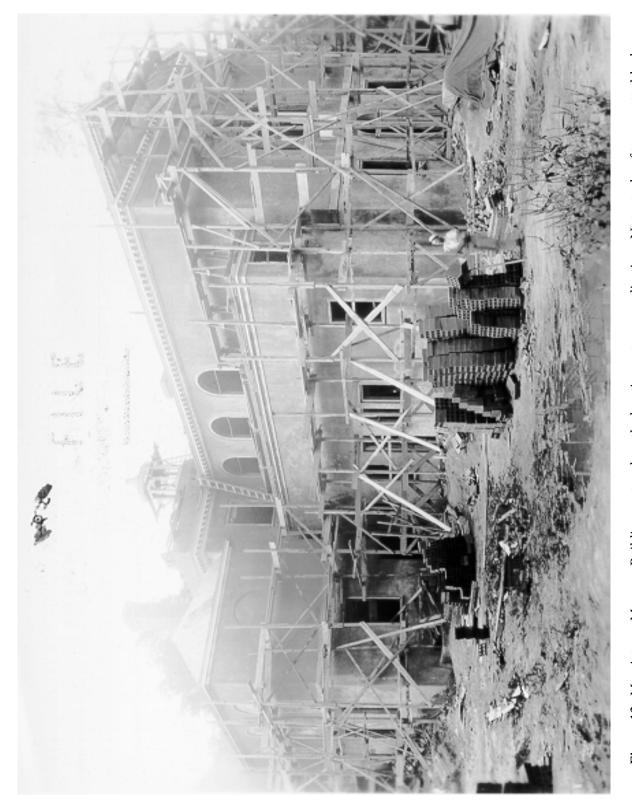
Morristown Museum Building: east and north elevations, stucco application. Note stacks of terra- cotta blocks (1936).
